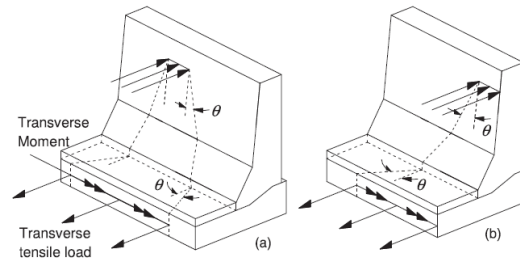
Transverse load dispersion at (a) interior portion and (b) end portion of barrier wall
